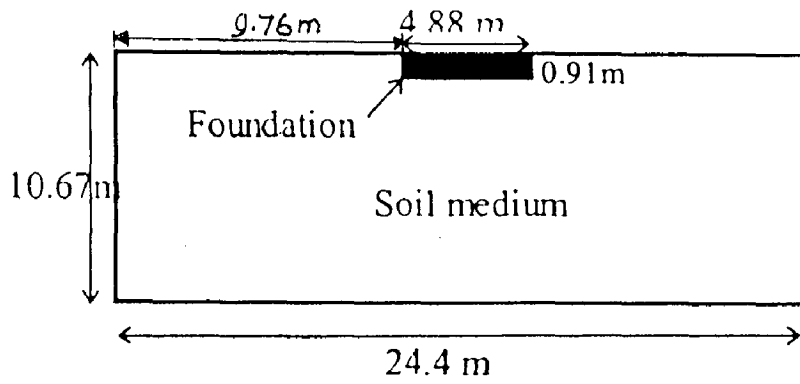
A machine foundation and surrounding soil (Richart)
